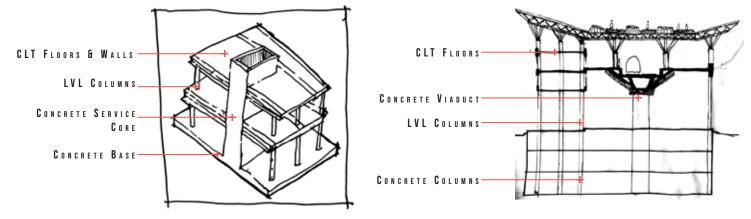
Hybrid multi-storey timber construction with concrete base and service cores (Author 2021).
